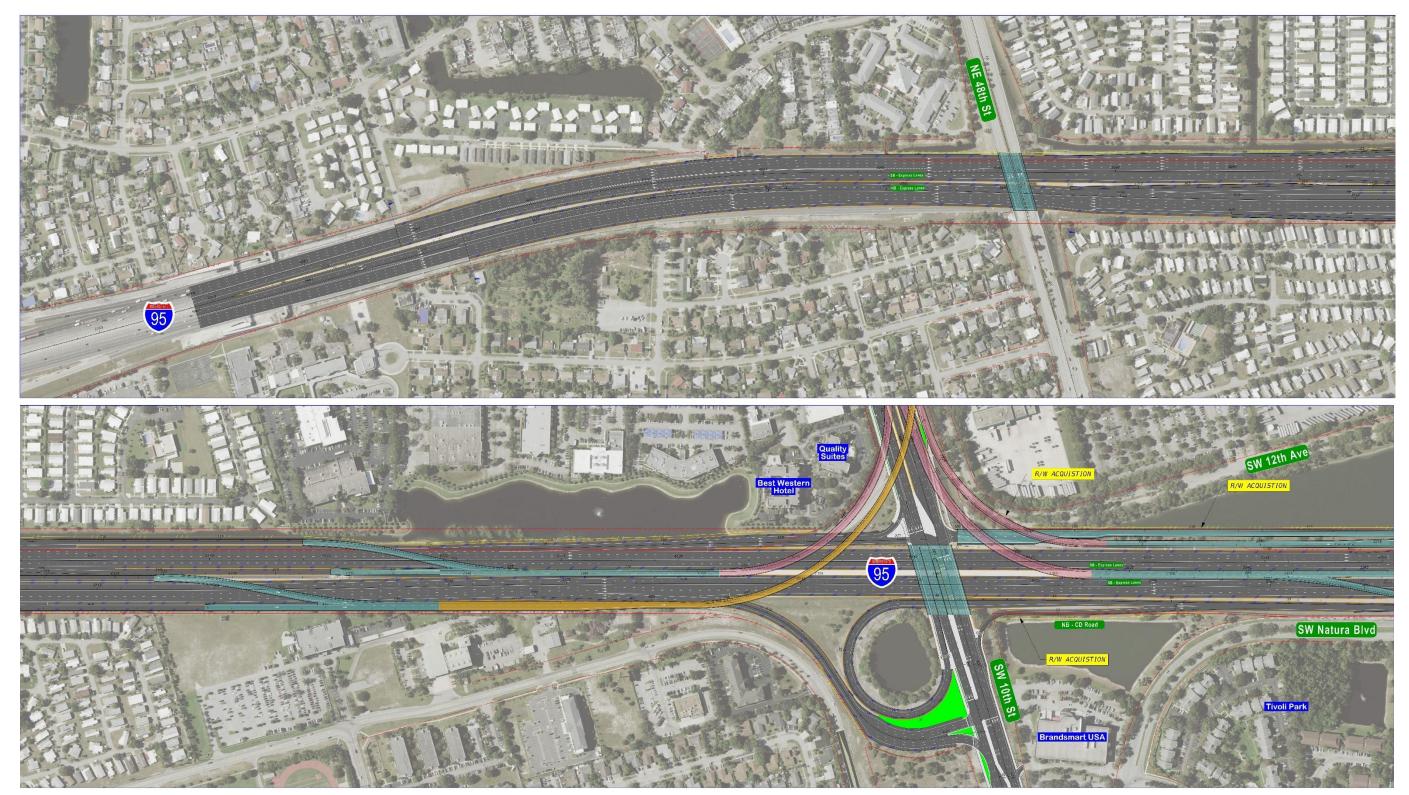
2: Alternative 2 Concept Plan (South of SW 10th Street)
